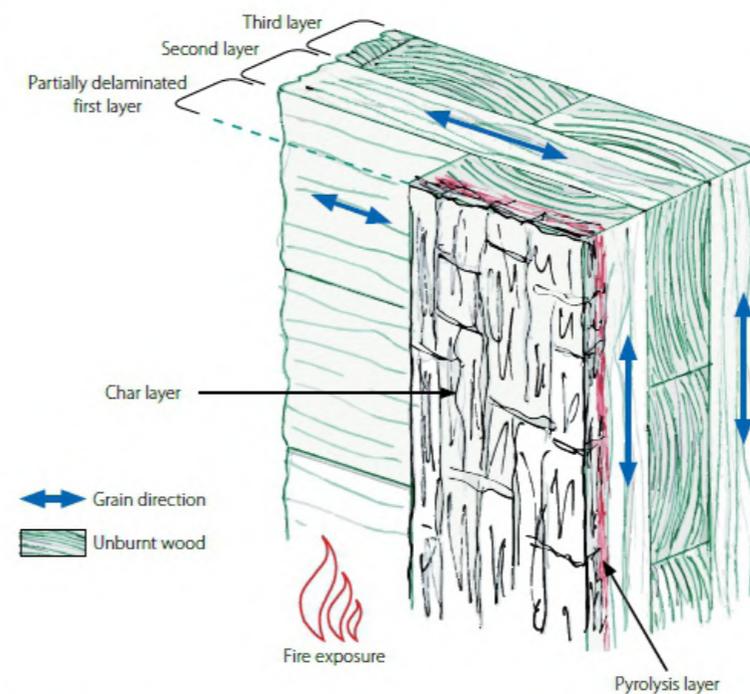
Cross-laminated timber wall panel exposed to fire (adapted from Buchanan (2002))
